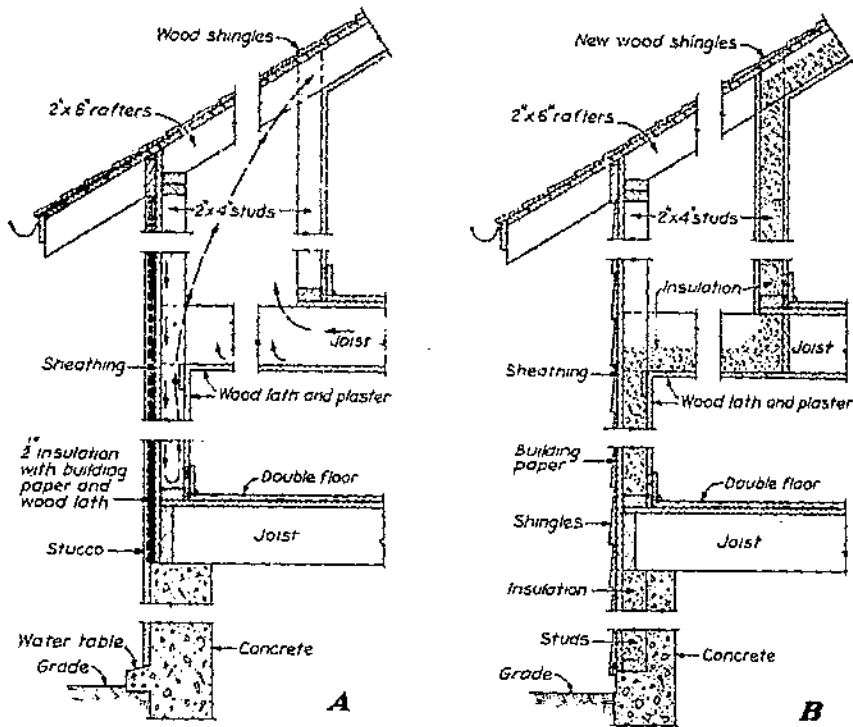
A, Wall section of house No. 1, showing how air is free to circulate within the construction. This condition was typical for most of the old houses. B, Wall section of house No. 1-R, showing how insulation prevents convection currents within the construction.
